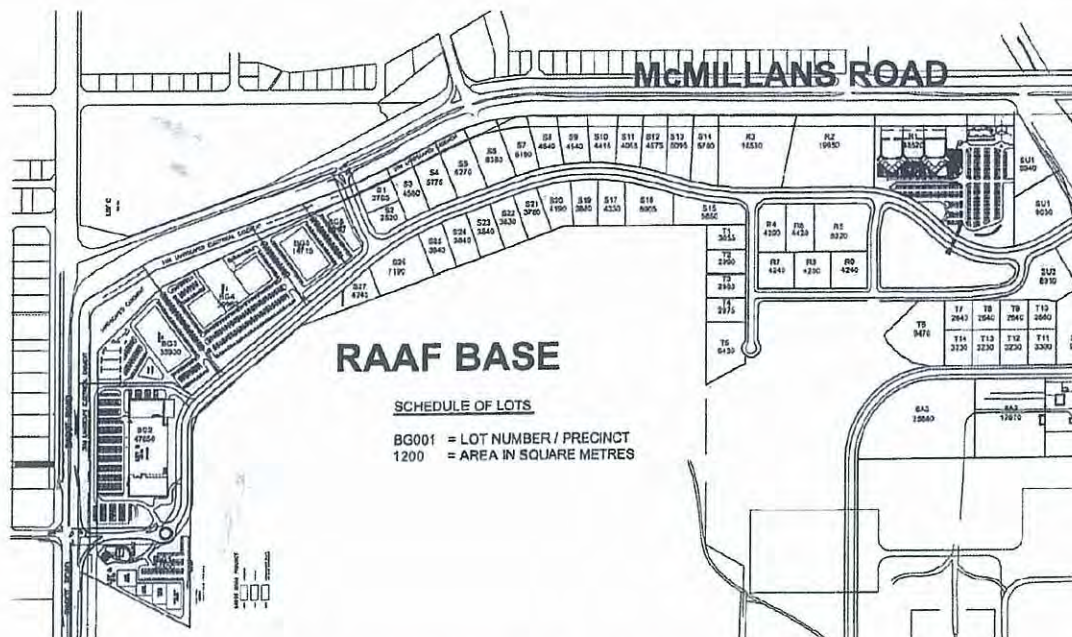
PLANNED NEW ROAD CONNECTION WEST OF BAGOT ROAD AT TOTEM ROAD INTERSECTION
